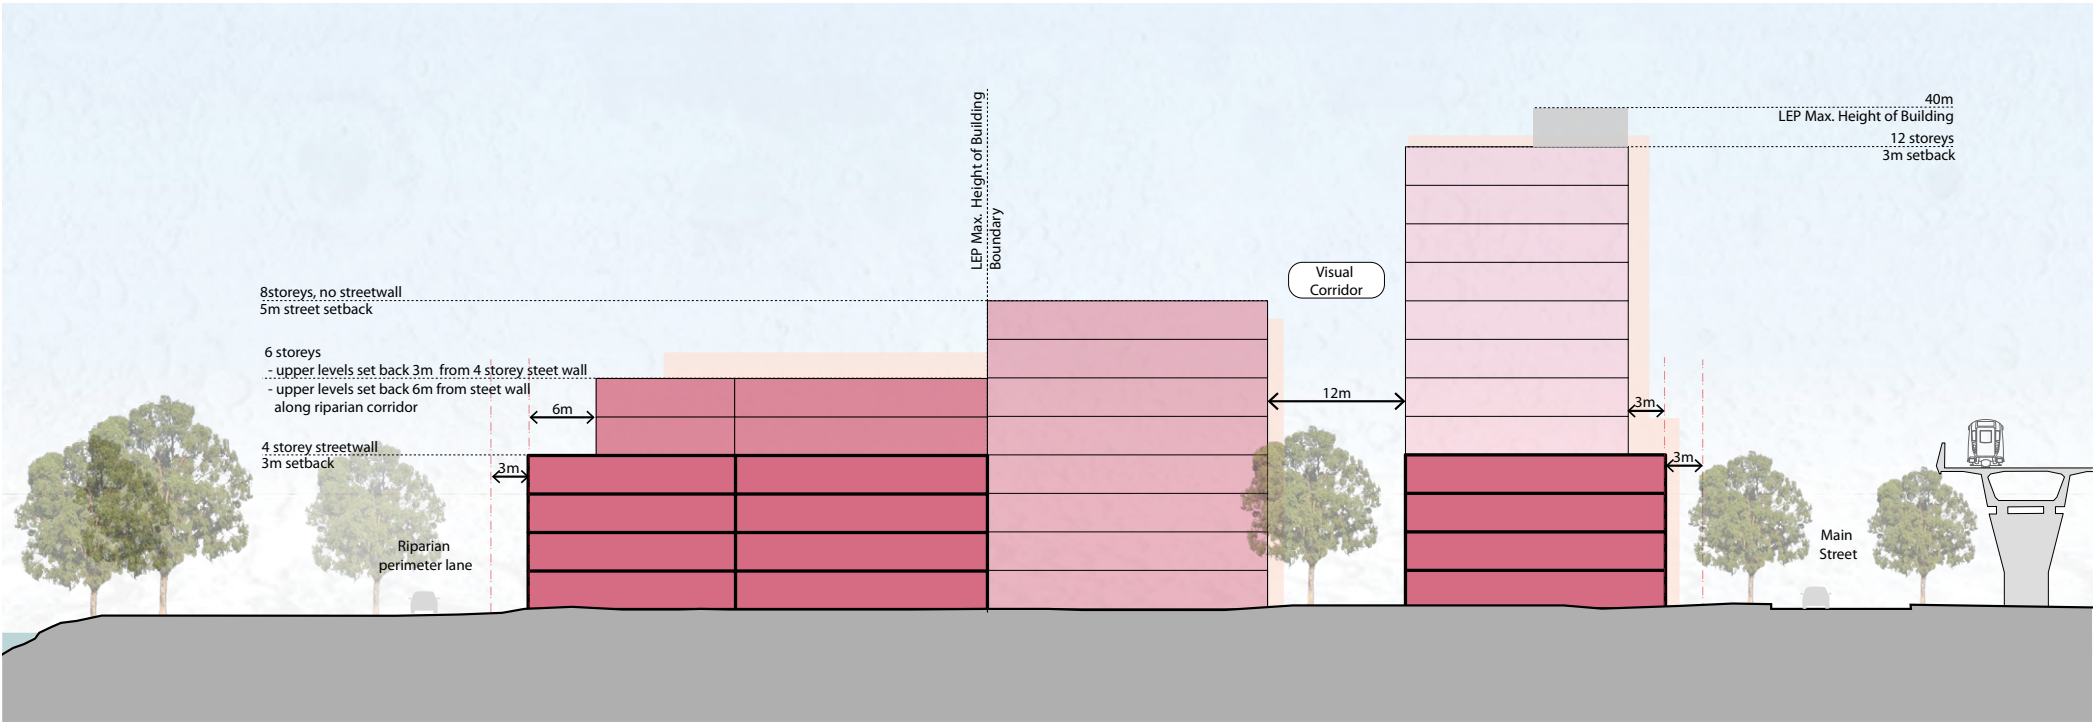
Proposed street wall setbacks in the Residential Core (Lots D,E and F)
